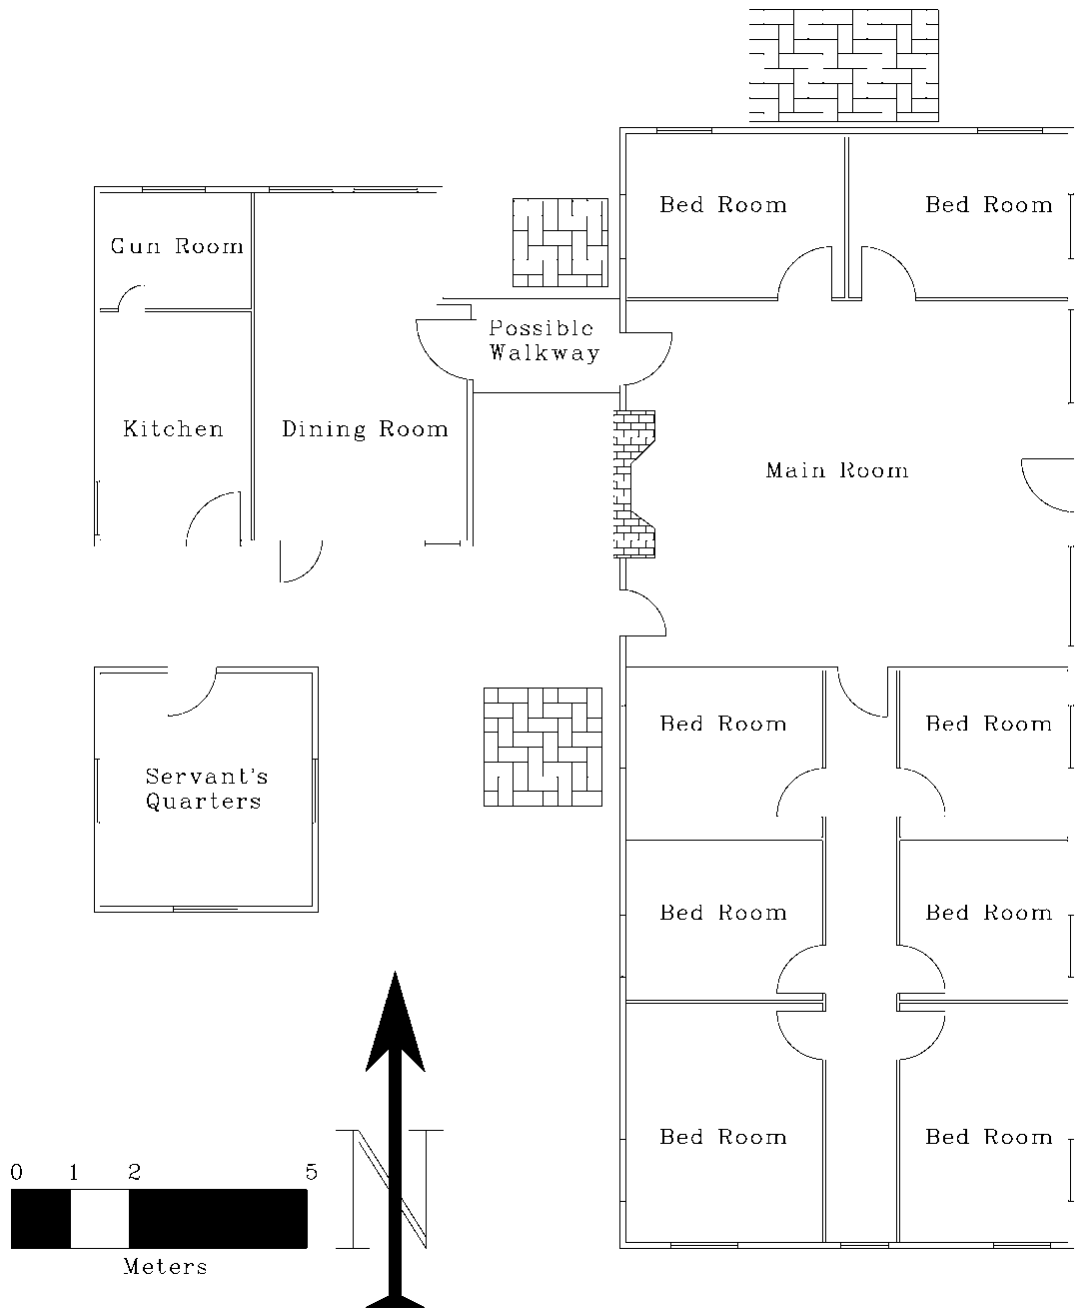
Proposed floorplan for the Hunt Club Lodge's second construction phase. Four additional bedrooms have been constructed in the southeast corner.
